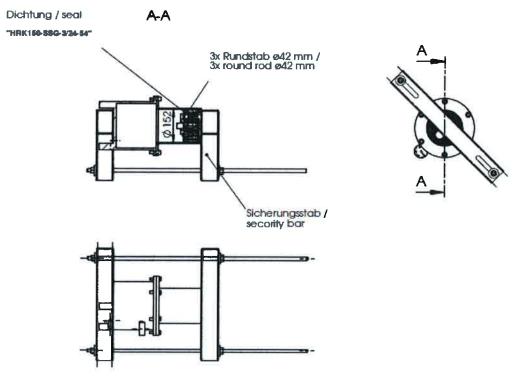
View and cross-section of the test setup with HRK150-SSG-3/24-54 - manufacturer's drawing.
